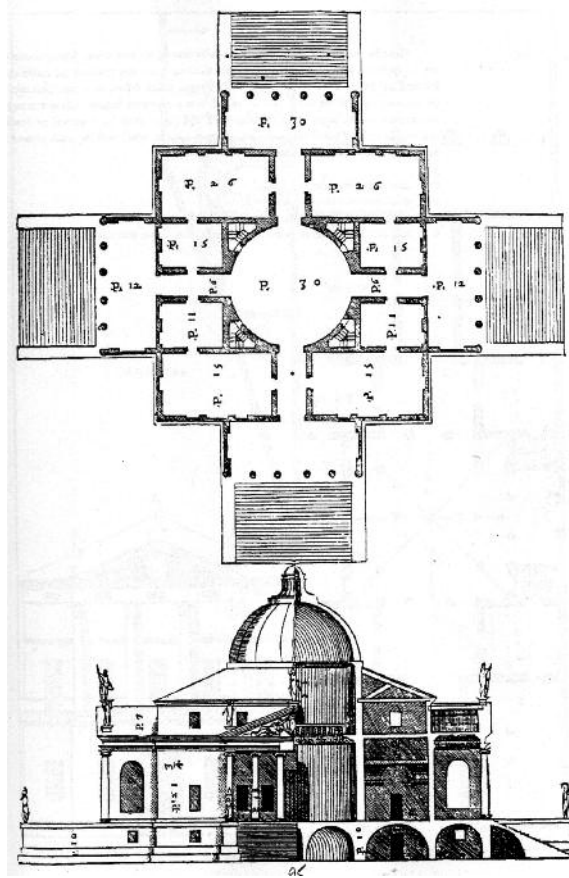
(right). Andrea Palladio, Villa Almerico 'La Rotunda', plan, half elevation and half section. Woodcut in *I Quattro libri dell'architettura*, bk II, 1570.
